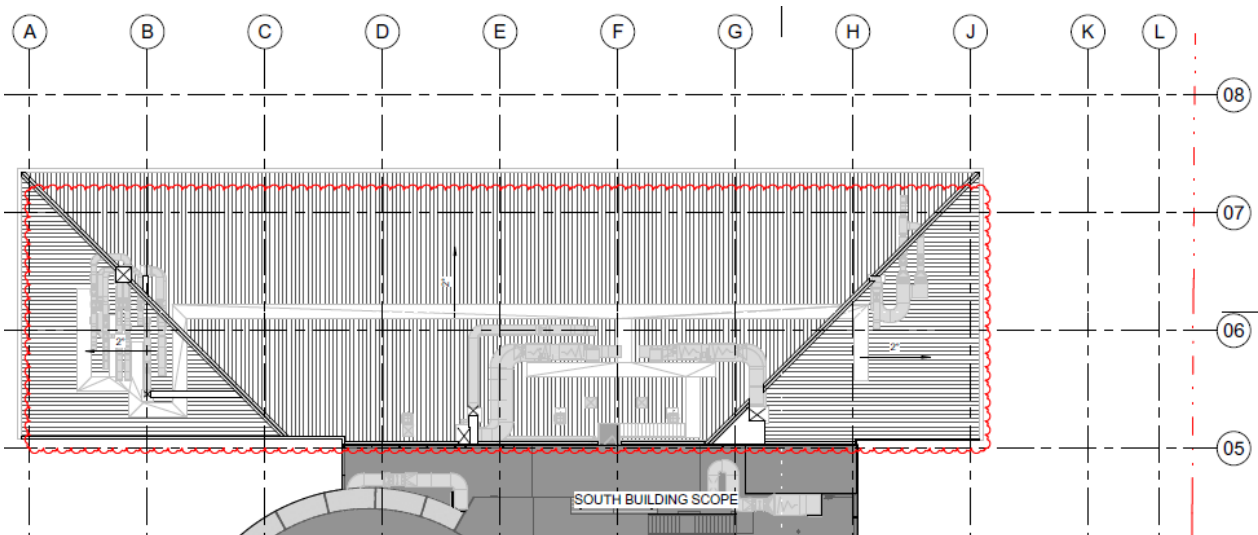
Proposed Amended Roof Plan Layout (Source: CGA)
